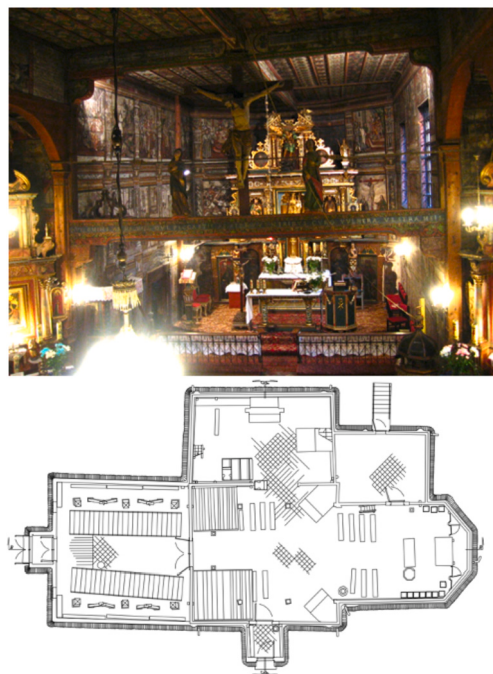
Interior photograph and floor plan of St. Michael the Archangel Church in Binarowa.
